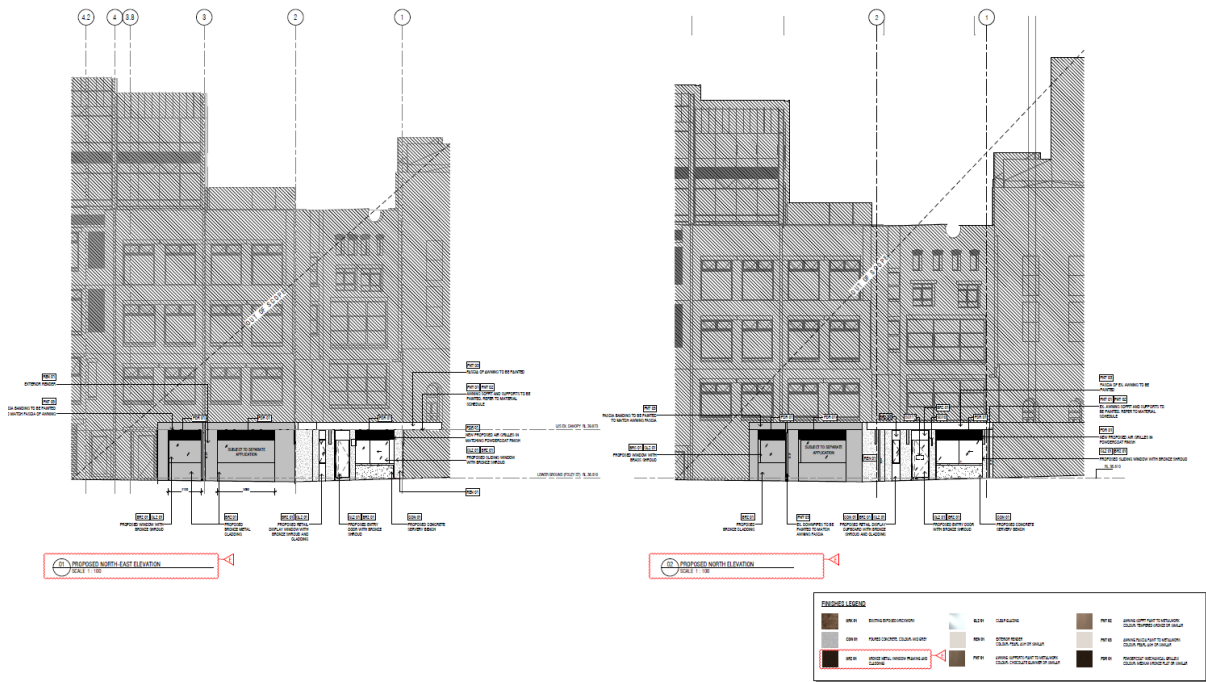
Proposed north-east Foley Street (left) and north Burton Street (right) elevations
